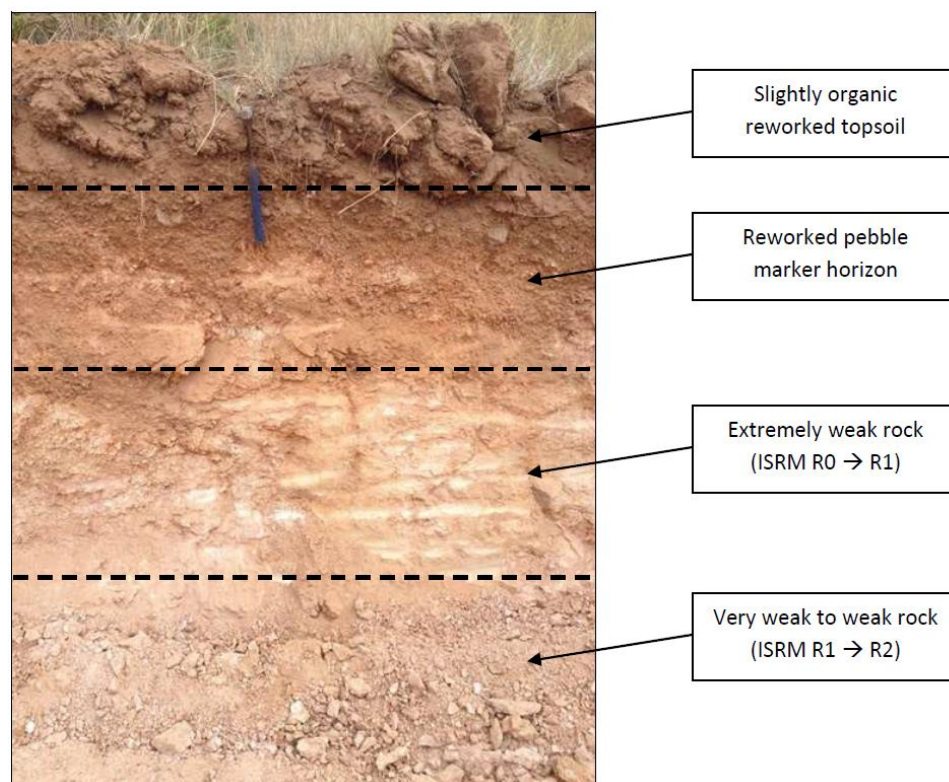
Test pit 8 typical soil profile (WSM Leshika Consulting, 2016)
